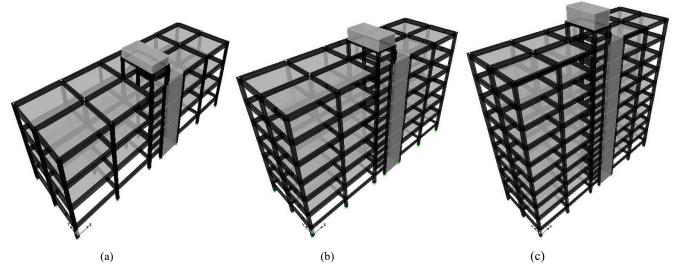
3D view of (a) Three storied building (b) Six storied building (c) Nine storied building
